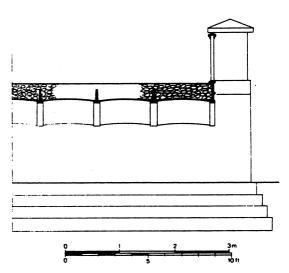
HALF SECTION THROUGH DECK (after Carver)
